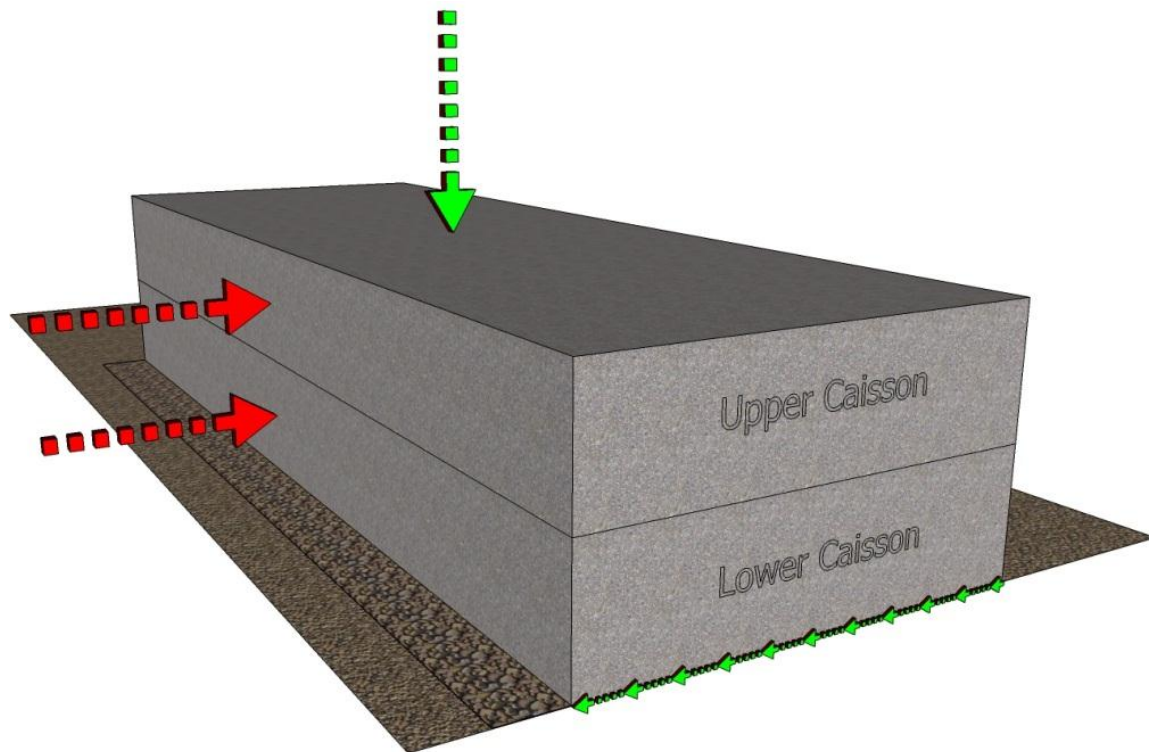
illustration failure mechanism, horizontal sliding of both caissons together
